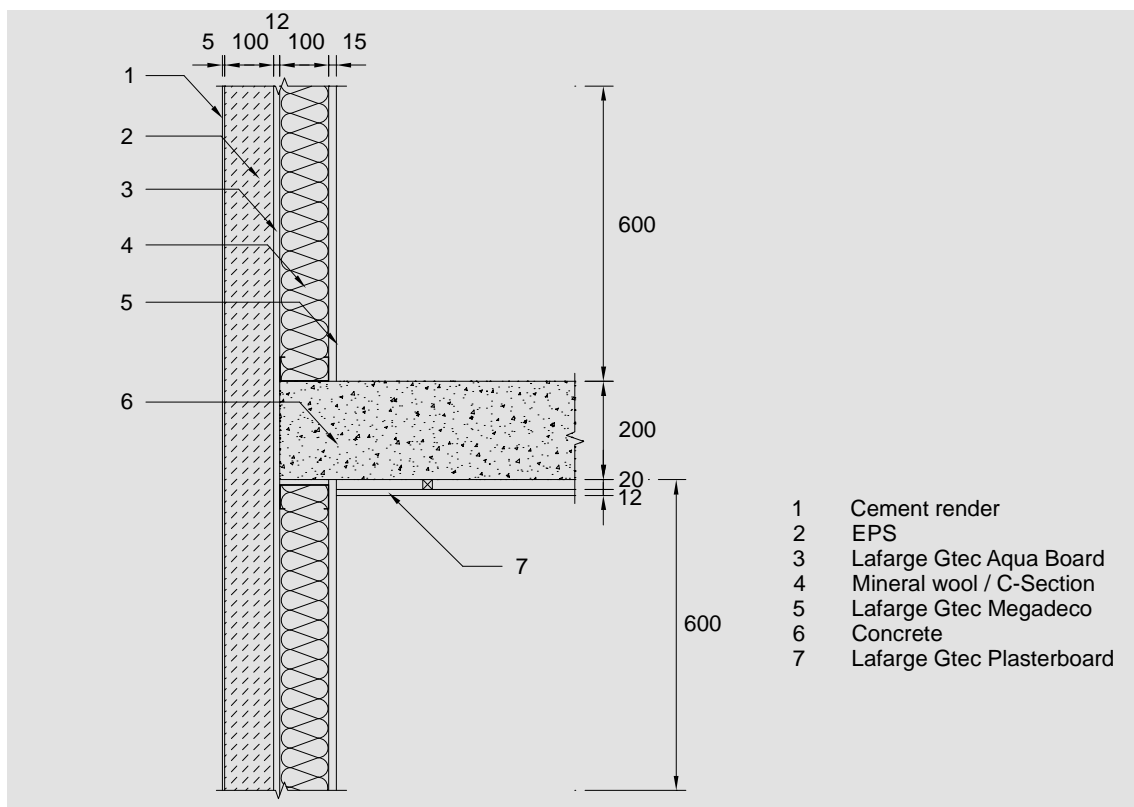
Light steel infill wall in a concrete framed building- no cavity system
